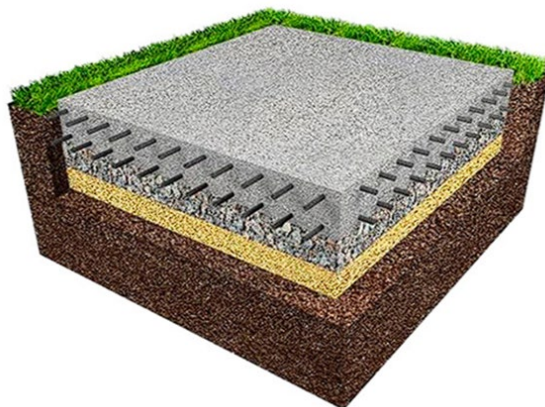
Multilayer surface protective reinforced-concrete slab placed on draining layers of gravel and sand
